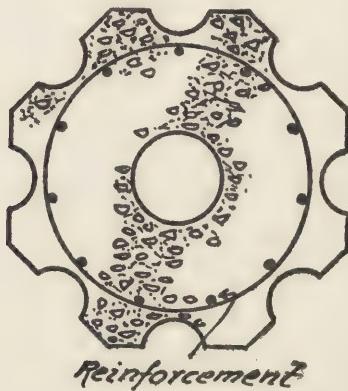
Cross-Section of Corrugated Pile Showing Reinforcement.
